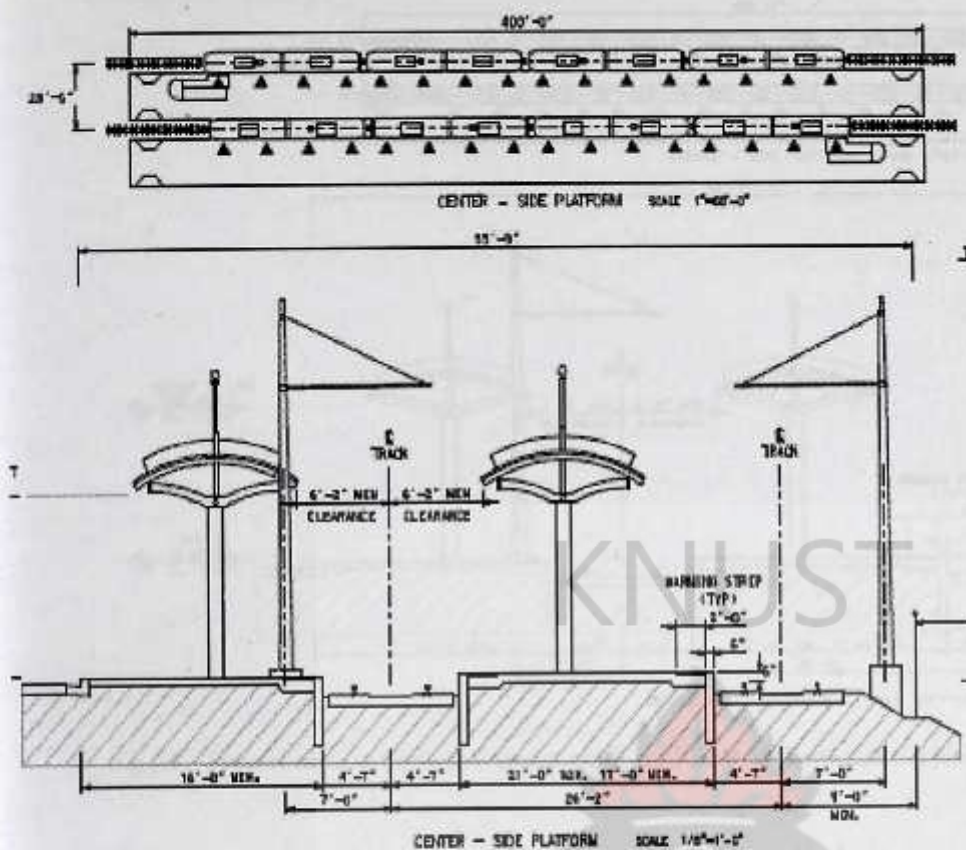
A typical section through a center platform (Source: Terminal Architecture and Engineering)
